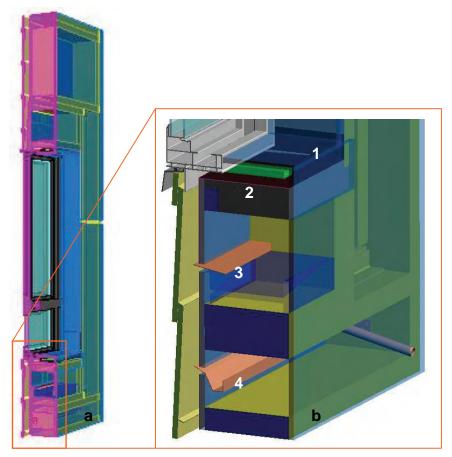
(a) Vertical wall section (inter.) showing location (b) of water collection troughs at (1) window on interior side of test specimen, (2) beneath window in removable trough; (3) beneath subsill for collection of water drained from subsill (see Fig. 6) and, (4) lower most trough for collection behind siding.
